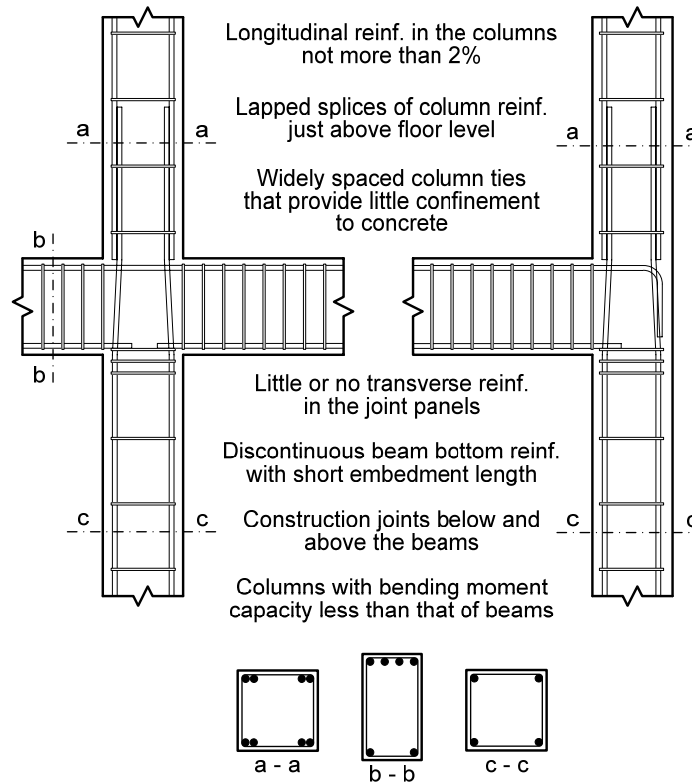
Typical details in lightly reinforced concrete structures identified by Beres et al. [2.3]
